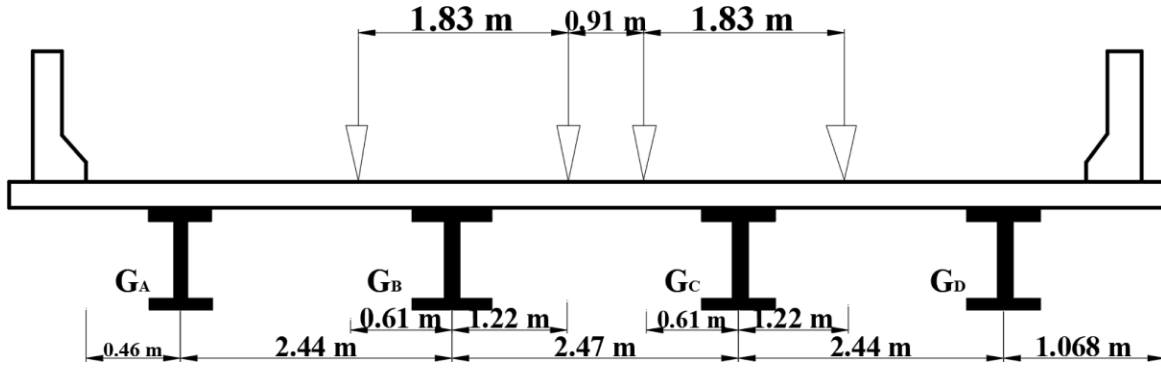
Typical transverse section of the bridge showing HL-93 loading location (AASHTO 2010).
